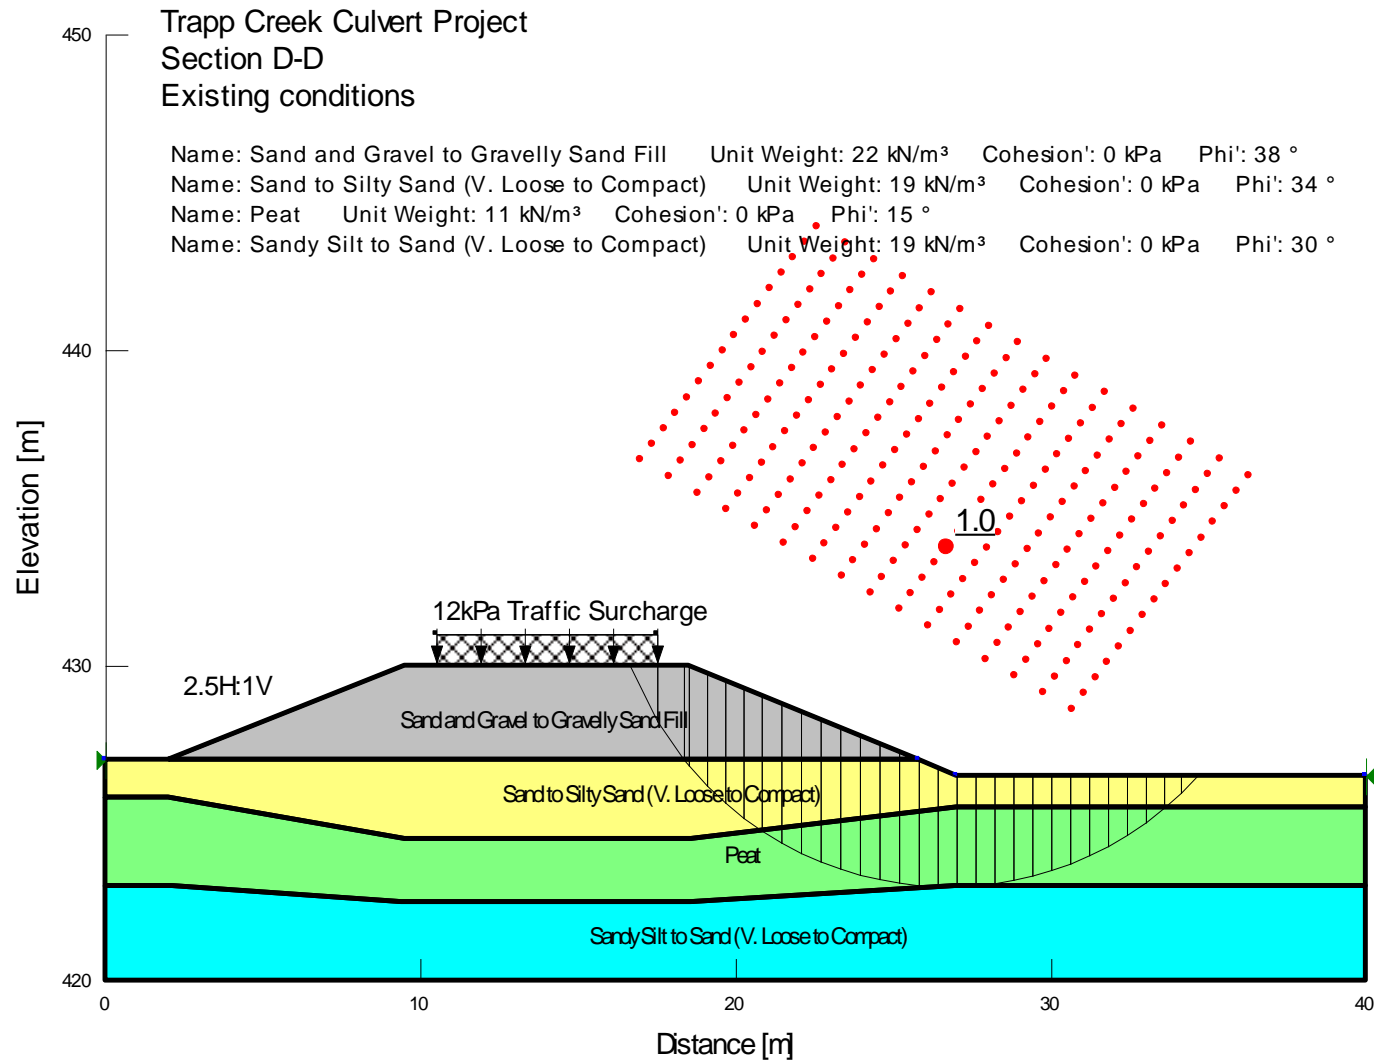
Results of slope stability analyses, existing embankment at Section D-D
